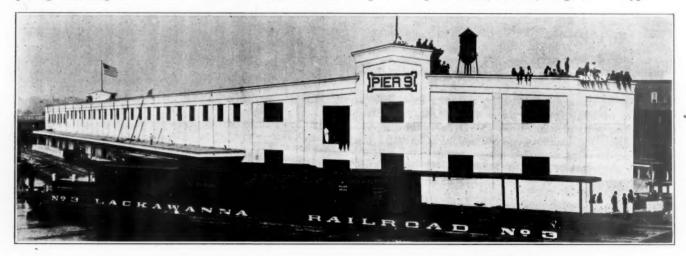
Example of Concrete Construction as Applied to Pier Sheds
